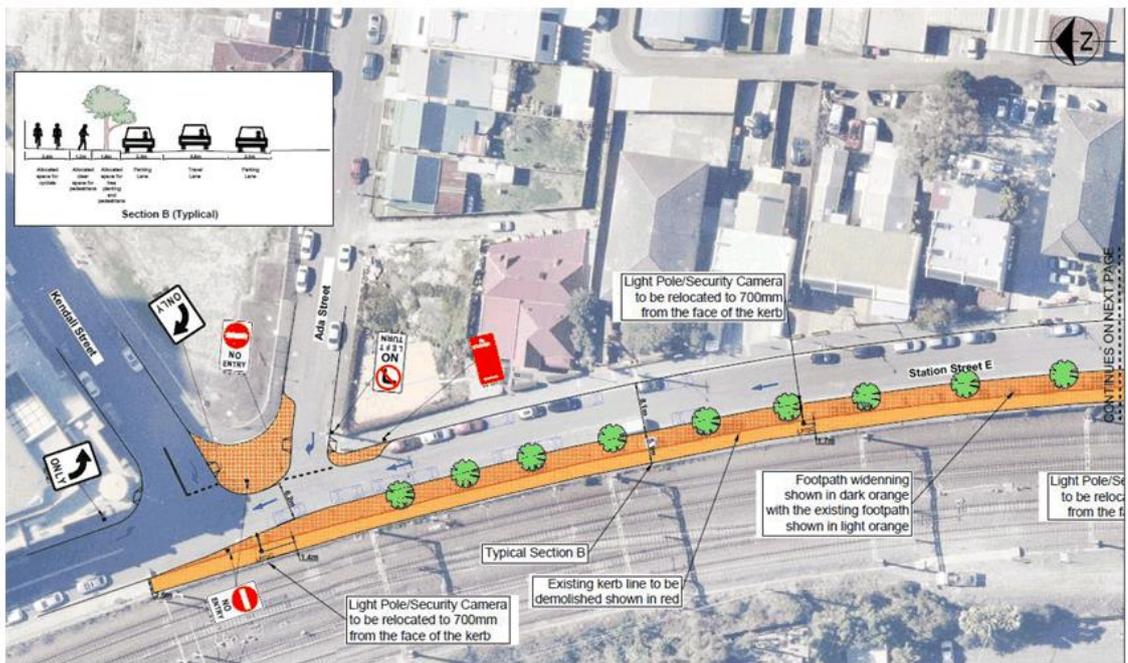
Concept plan of the footpath widening in Station Street East, Harris Park
